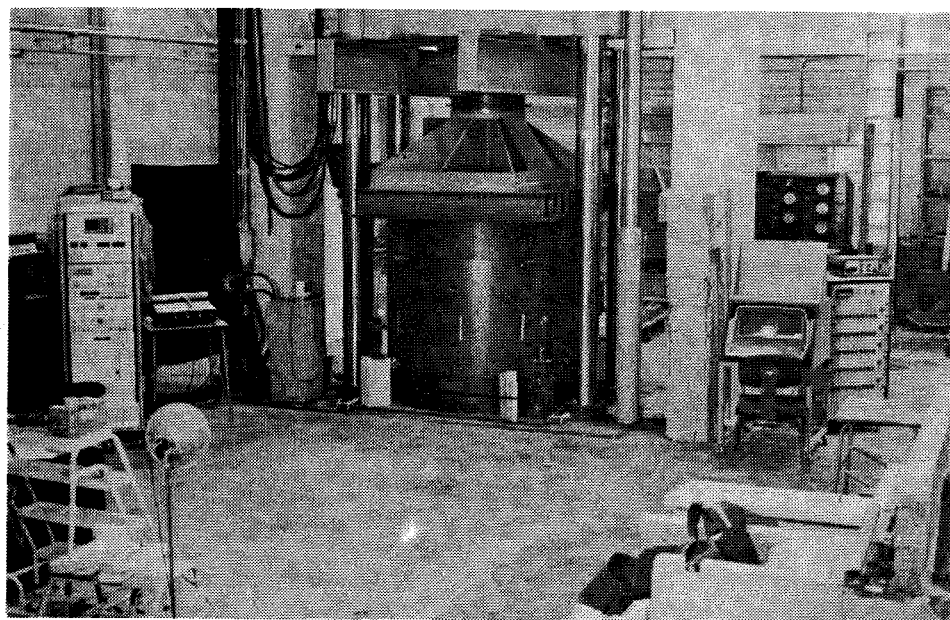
Test Set-Up for Large Diameter Compression Specimens
